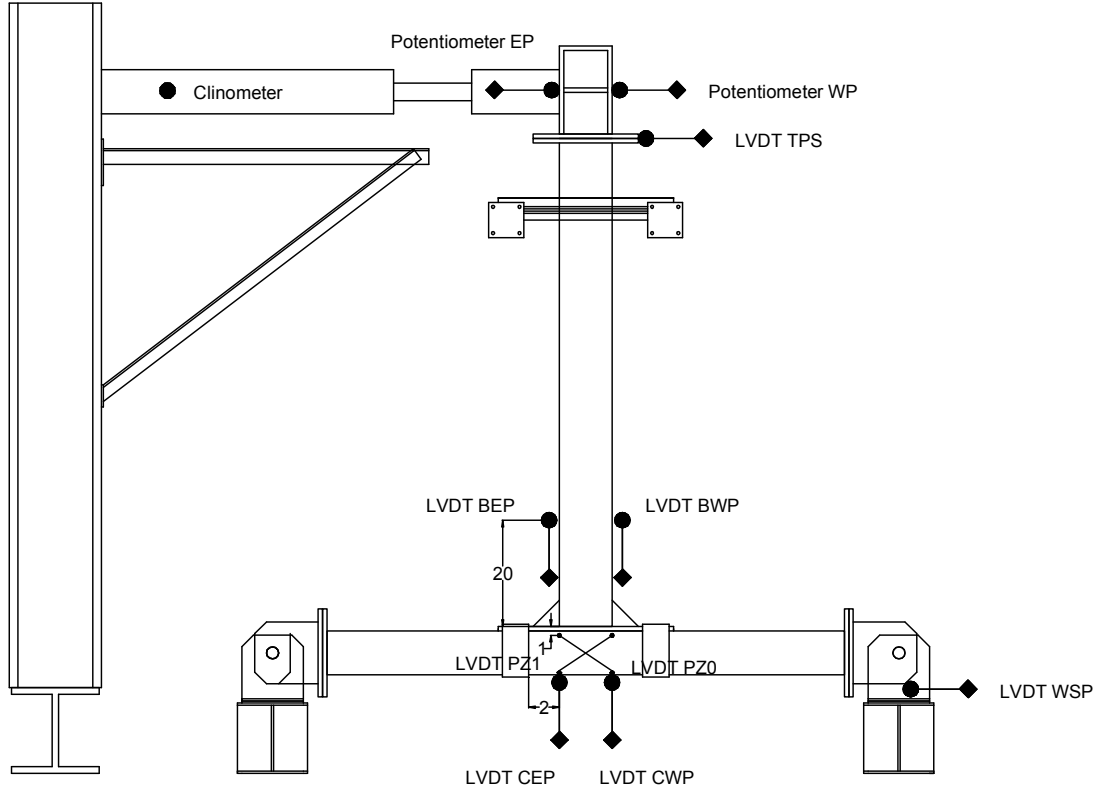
Layout of Instrumentation Primarily Used for Secondary Measurements for the Connection with Stiffeners (units in inch)
